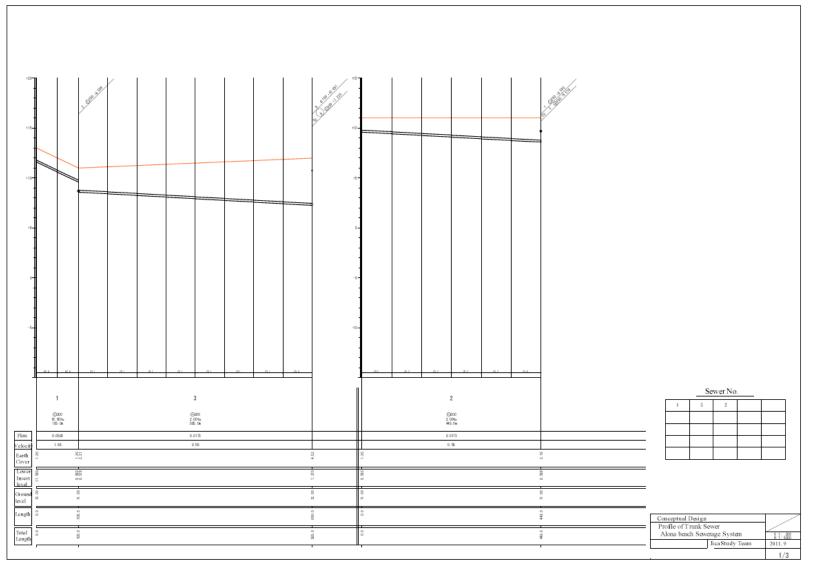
Profile of Trunk Sewer (Alona Beach Sewerage System)
